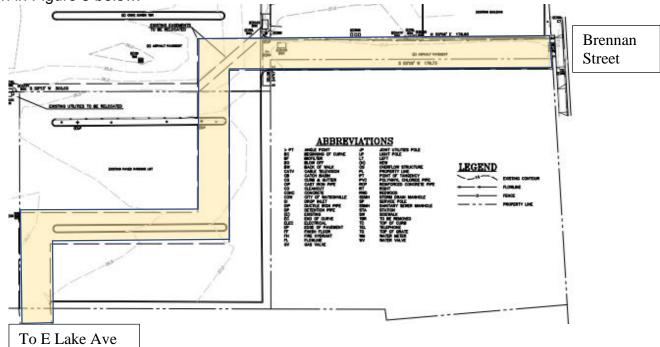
Proposed Circulation Plan Source: Portion of Project Plans Sheet C1
